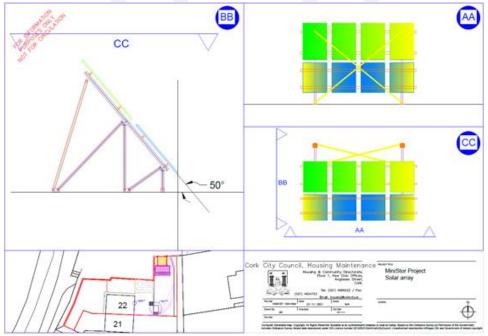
Depiction of the Plan (CC), Front Elevation (BB) and Open End-view (AA) of the MiniStor structures (Cork demo site).
